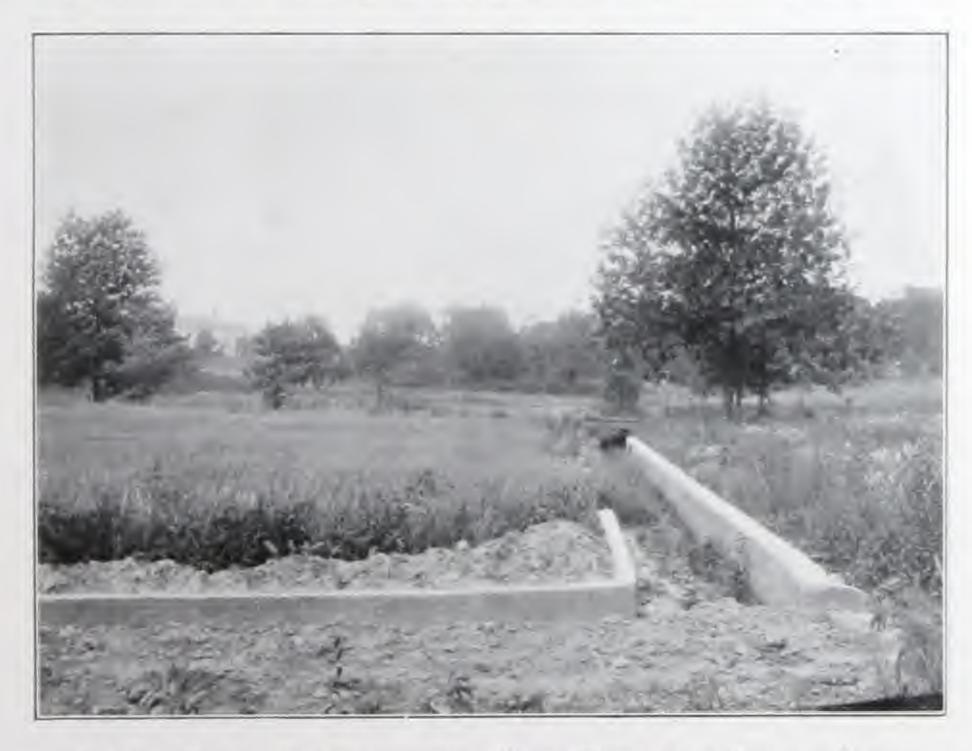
METHOD OF STRAIGHTENING A WATER COURSE BY A CONCRETE WALL.
